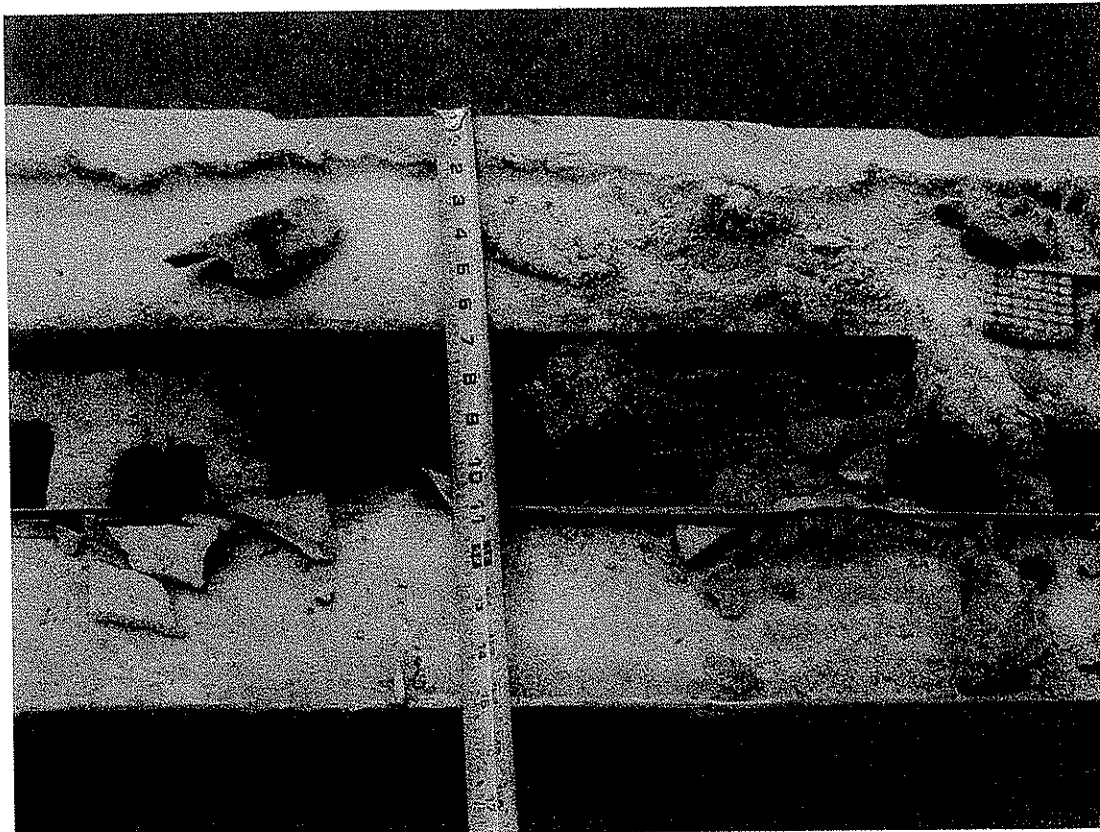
More Evidence of Moisture in Wall—Note Discoloration of Back Side of Precast Stone Unit
